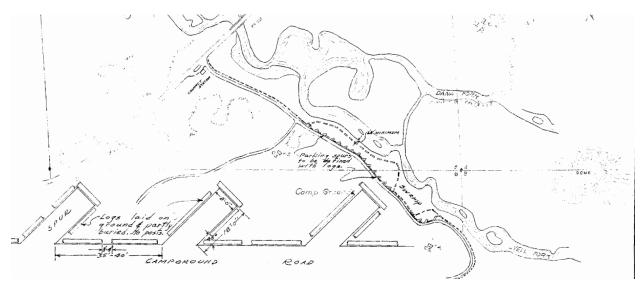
CCC Parking Spurs at Tuolumne Meadows (source: Campground Guardrails, Tuolumne Meadows. YOSE Archives 104-5394, 1940).
